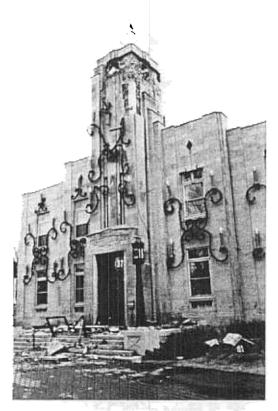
Loss of masonry cladding from clock tower of Montréal East City Hall
